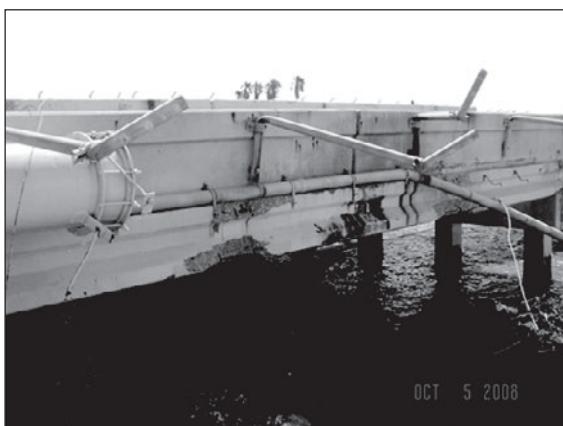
Damaged water line at Rollover Pass bridge crossing
